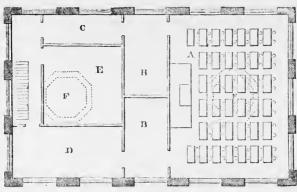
Plan of Second Floor, adapted to Fig. 150.
